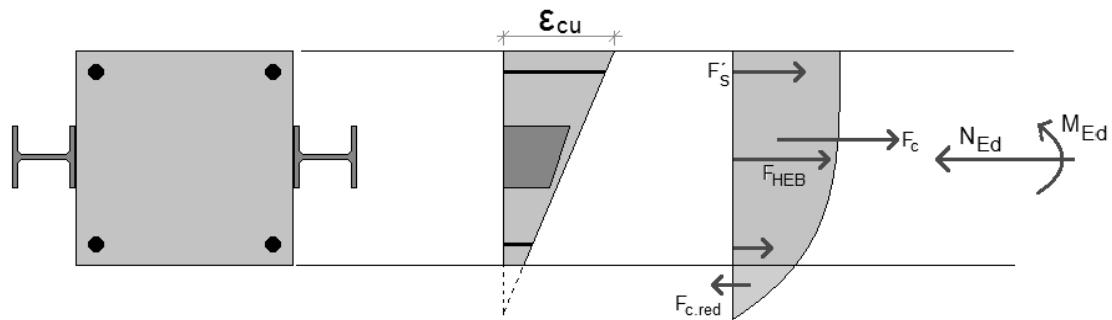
Model for sectional analysis of column section with vertically loaded prestressed steel profiles.
